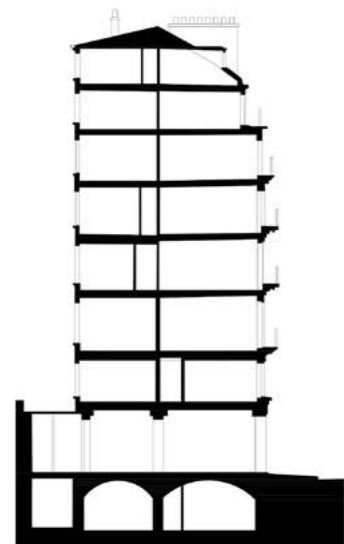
Section of Malesherbes building located within the Paris housing block
